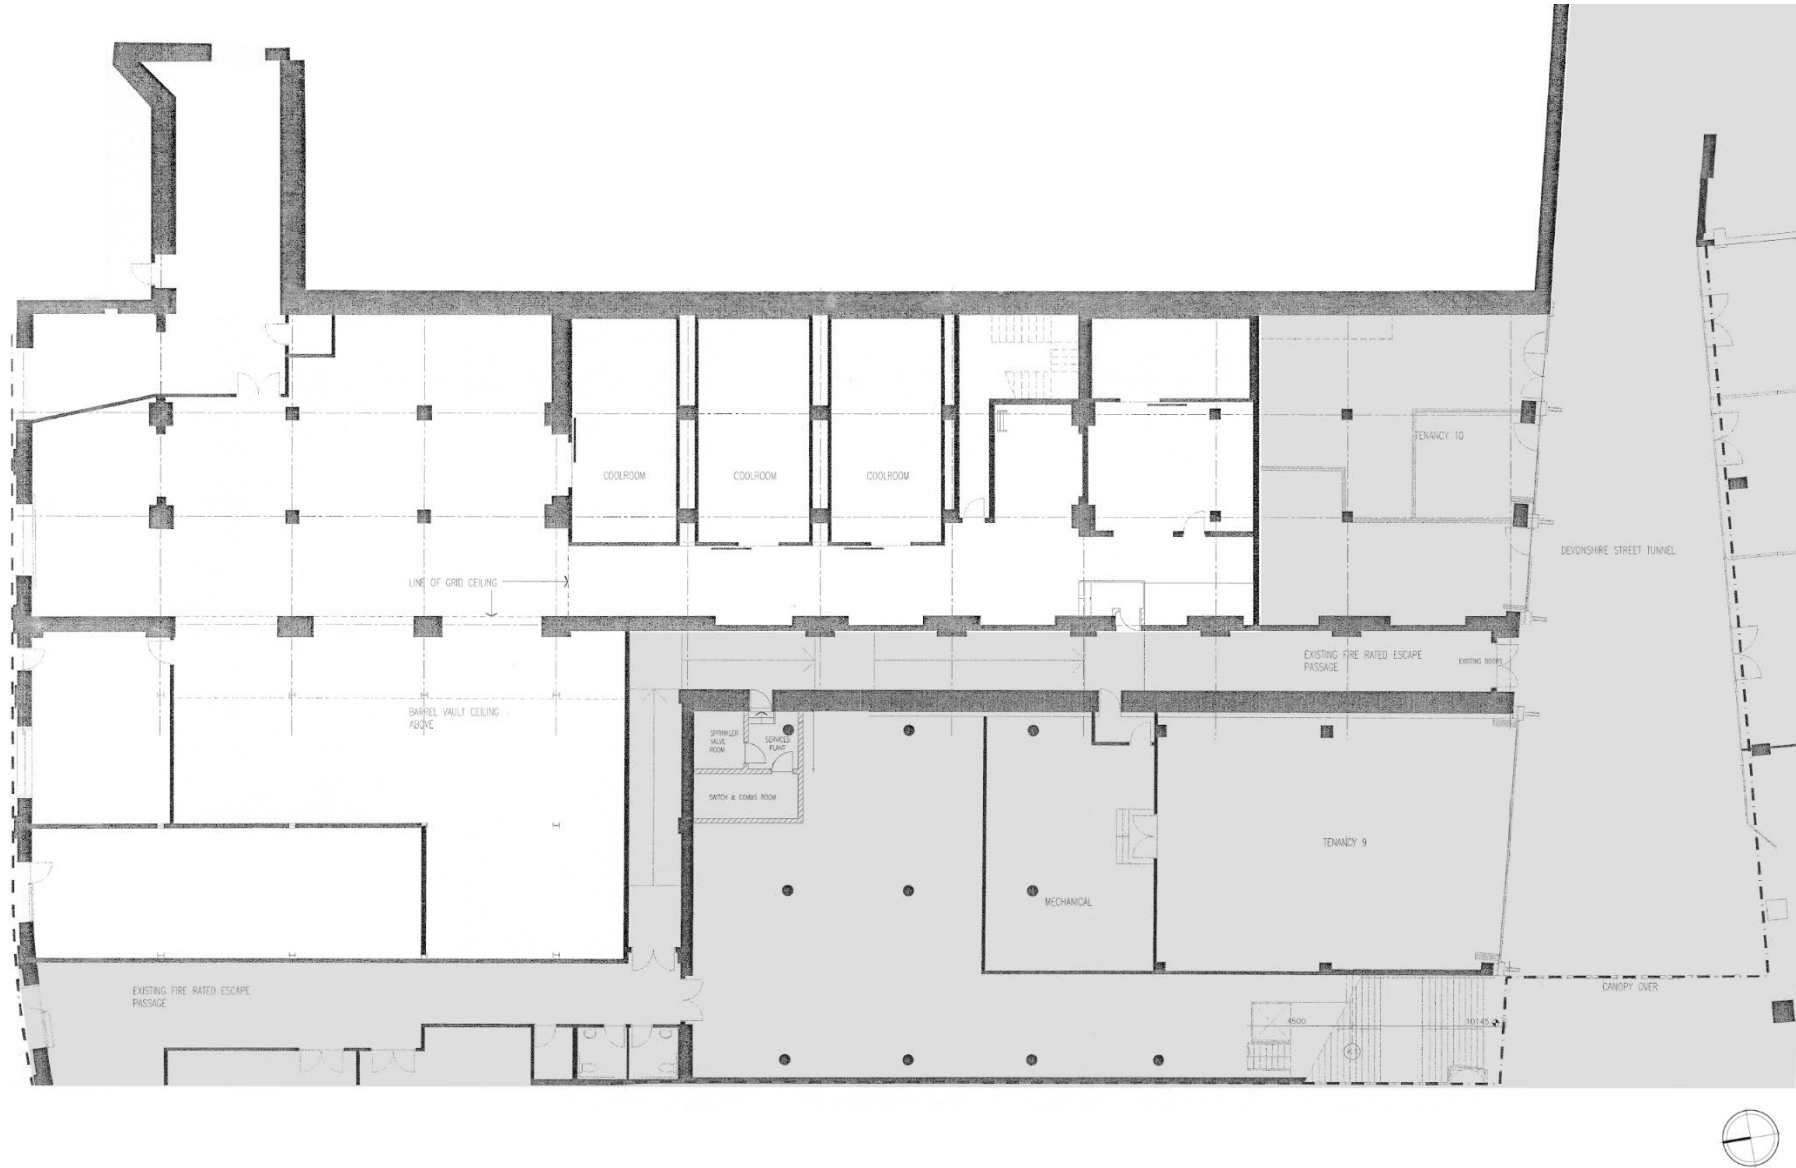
Lower Ground Floor Plan (grey area is not included as part of the subject site)
